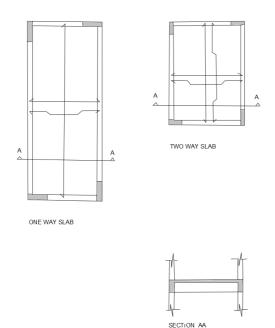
Structural plan (with reinforcement) and section of one way and two way slabs
